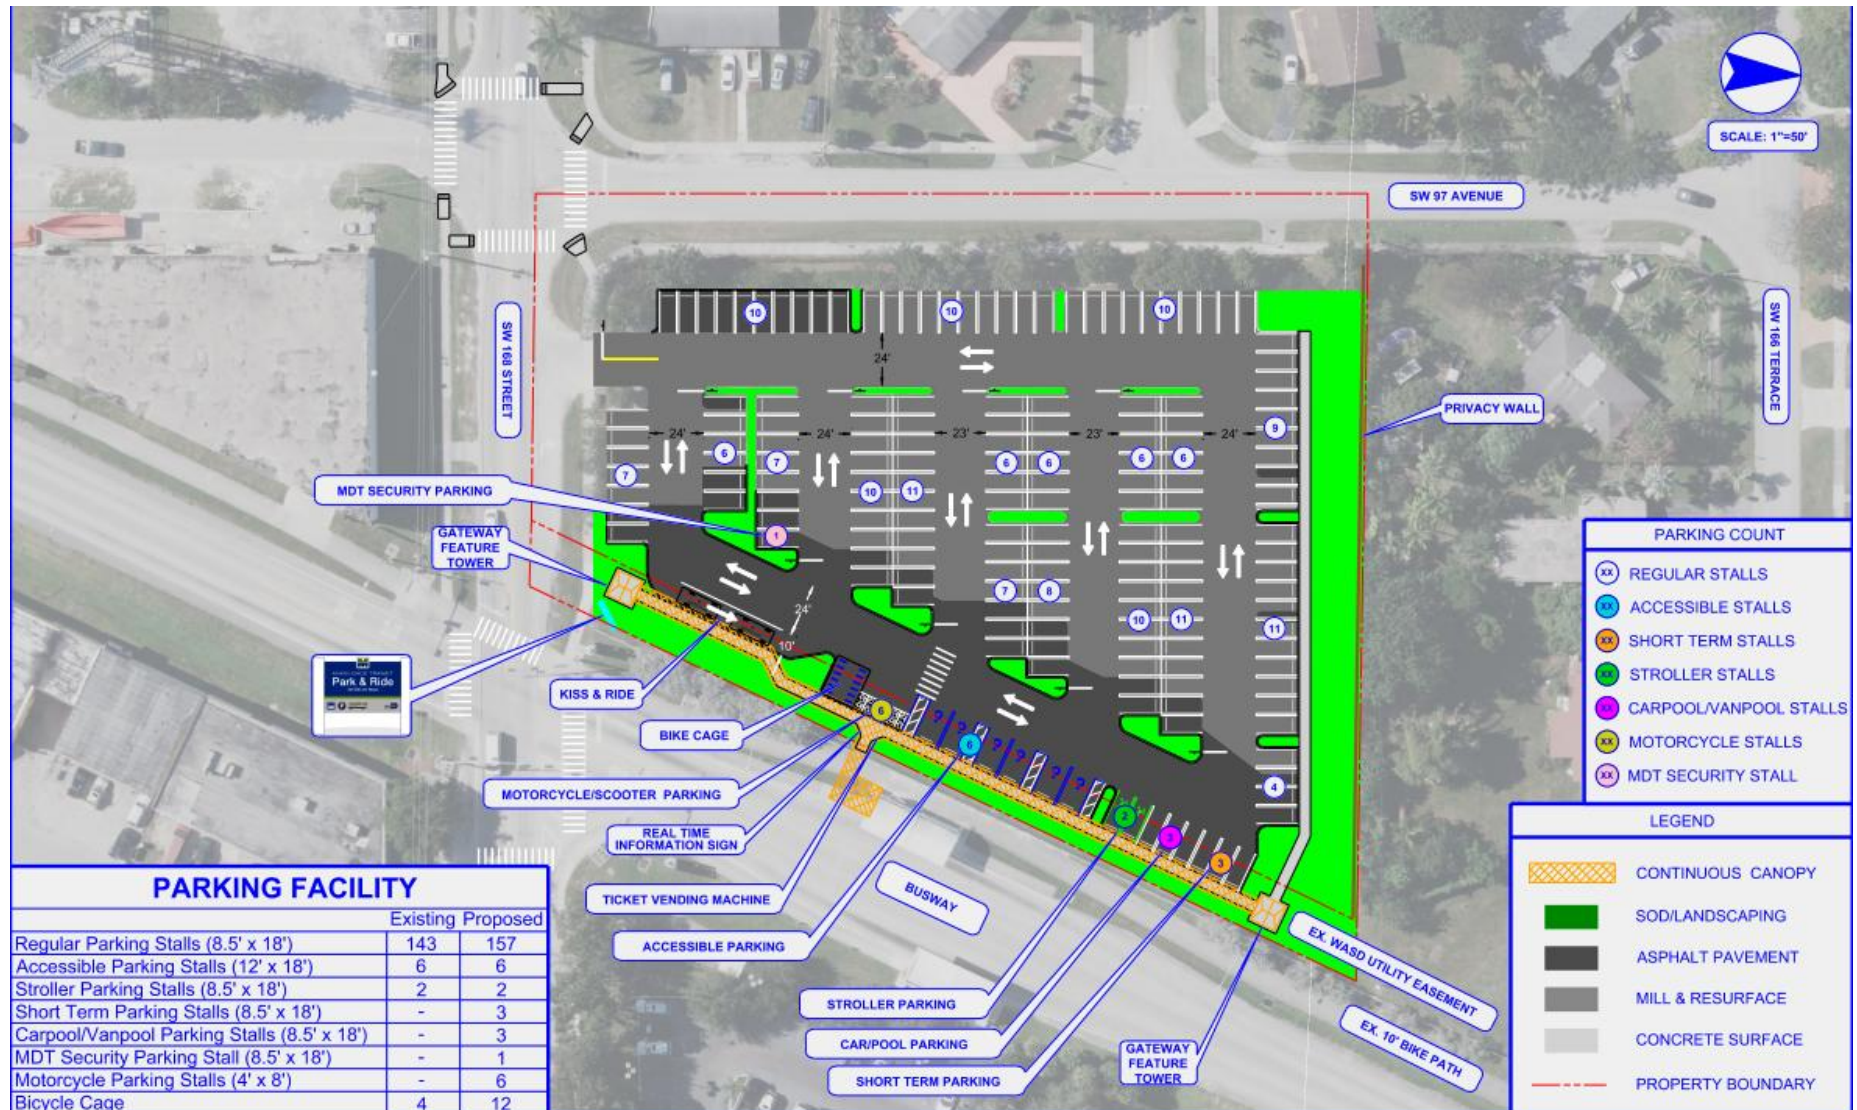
Busway Park-and-Ride at SW 112th Avenue Proposed Improvement Plan
